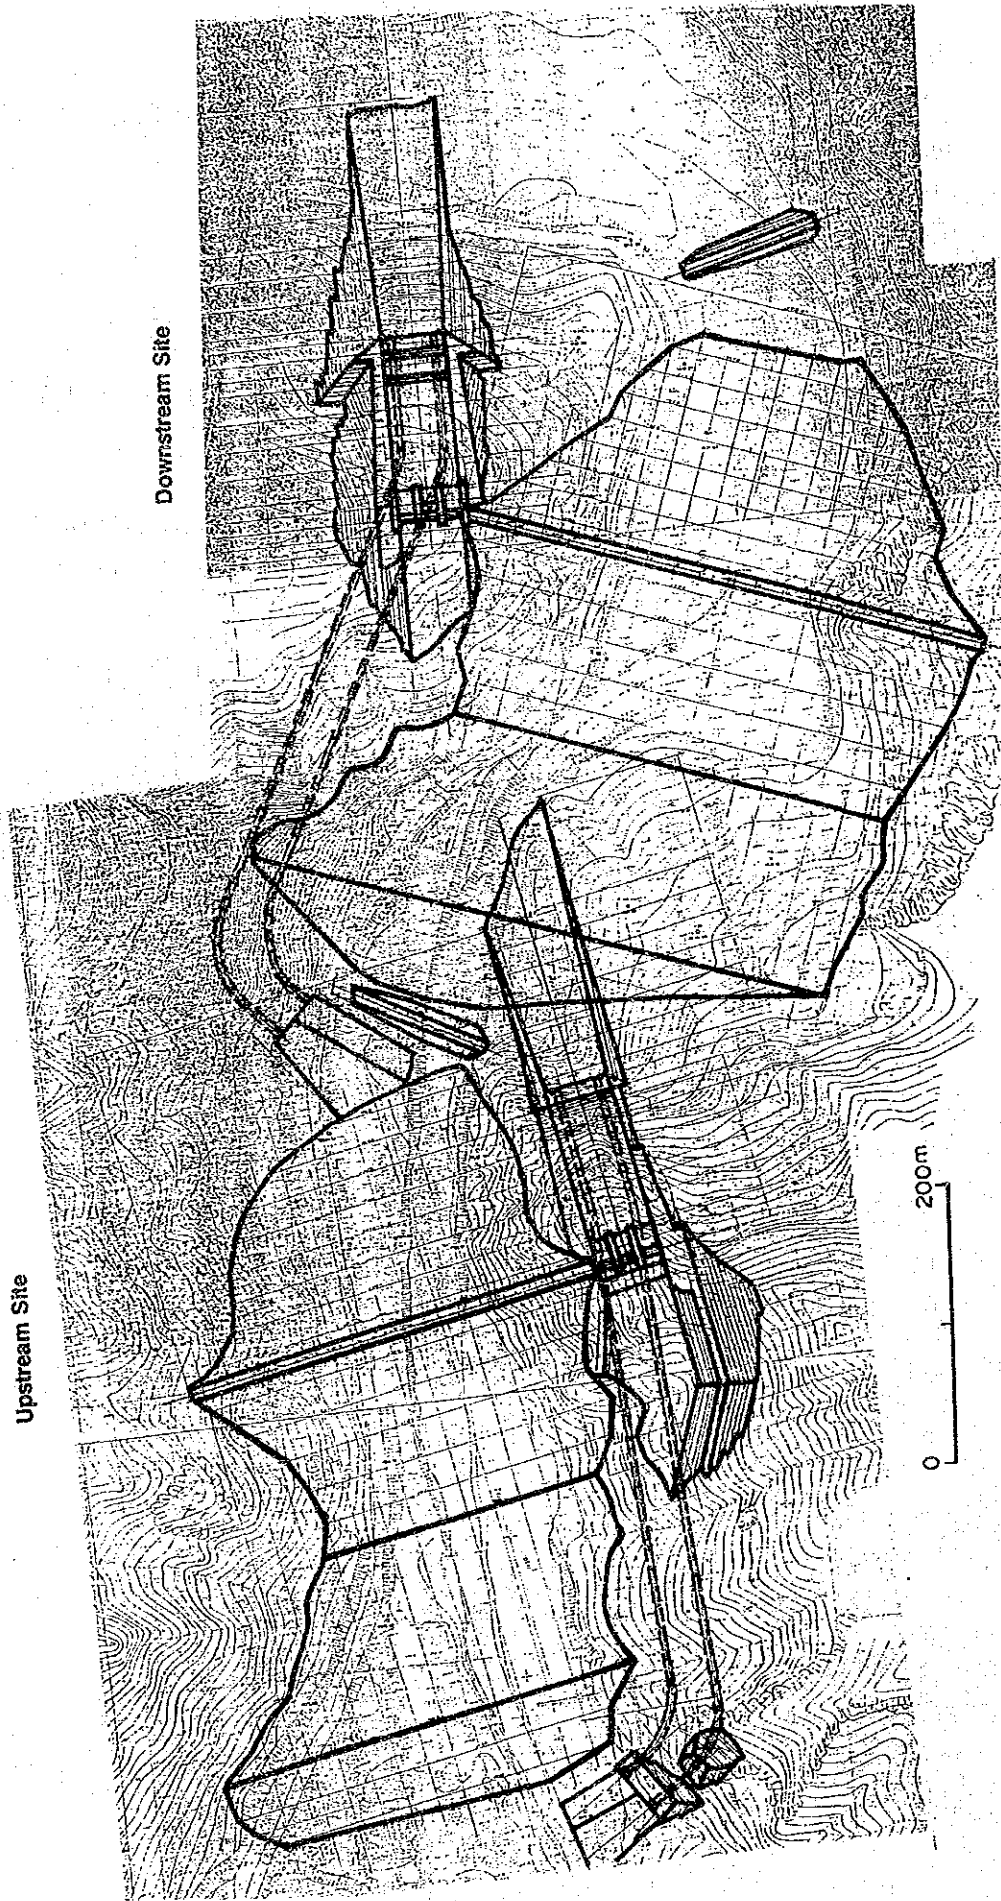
Preliminary Layout of Olur Dam Sites
